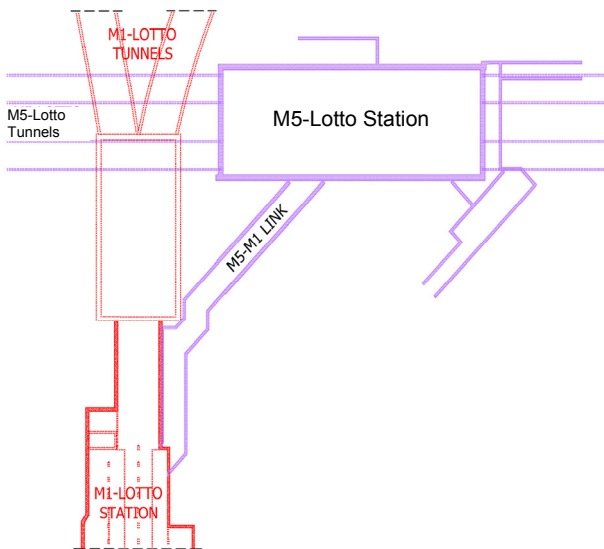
Schematic layout of Lotto stations and tunnels (plan view).
